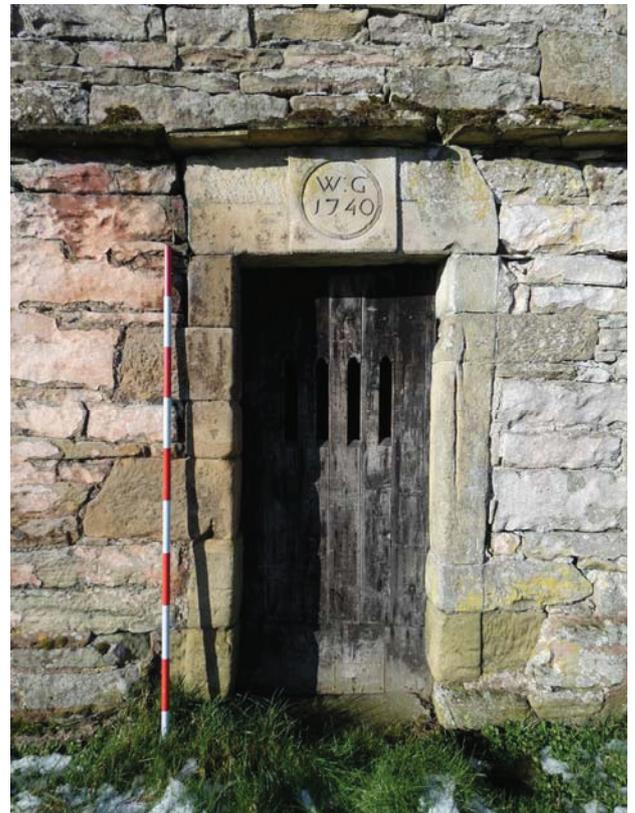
(right): The southernmost lower level doorway in the east external elevation, viewed from the east
